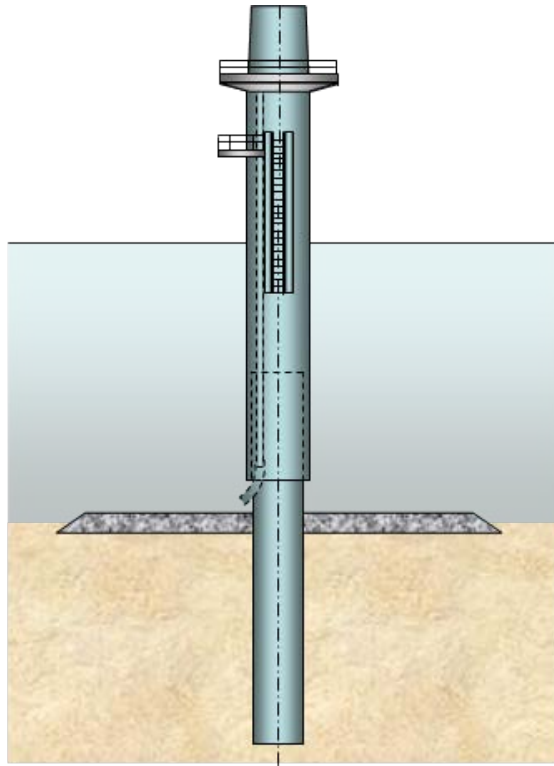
Example of a Typical Monopile Foundation Design with Grouted Transition Piece
